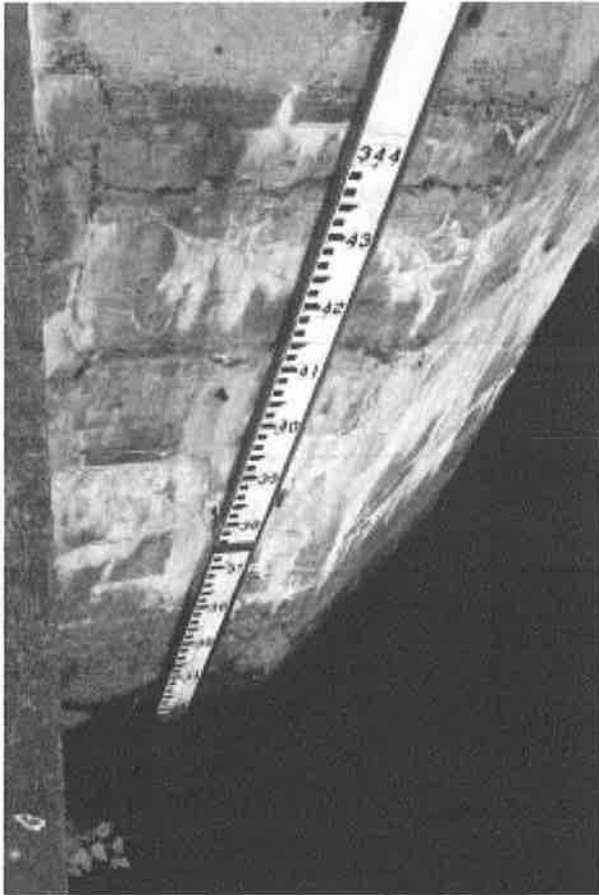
View of the staff gage mounted on a wall in the headpond.
